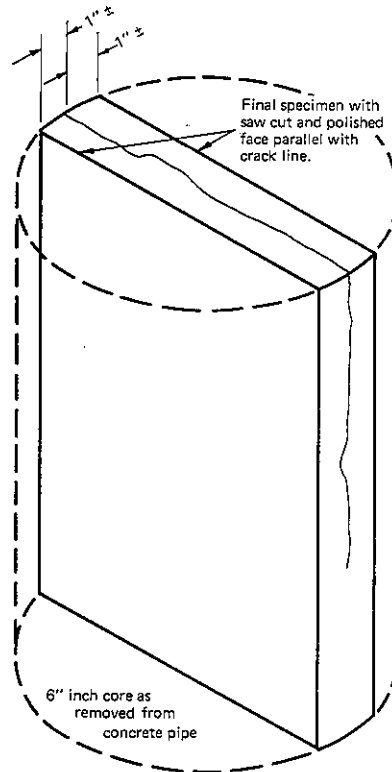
CRACKED CORE TEST SPECIMEN.
